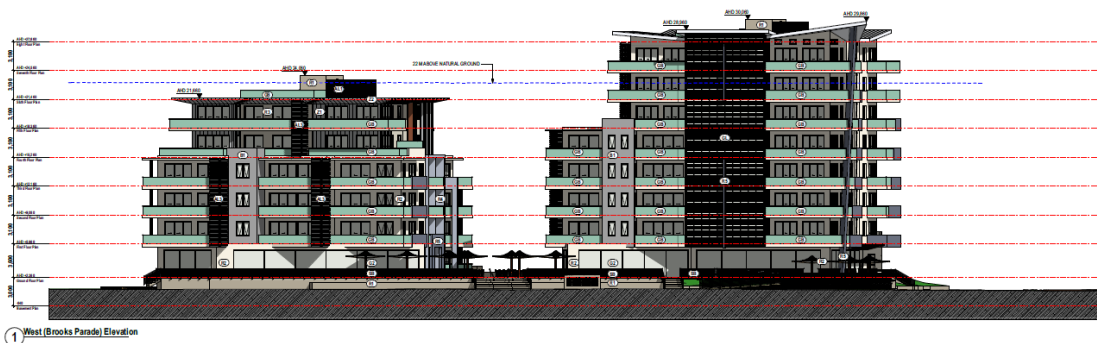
A: Proposed building heights in relation to 22m Building Height Limit under the LMLEP2014 for Blocks A and B
